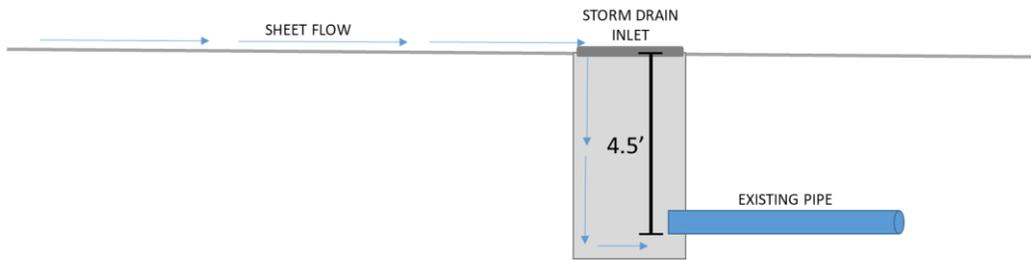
Typical Storm Drain Inlet Elevation Configuration
